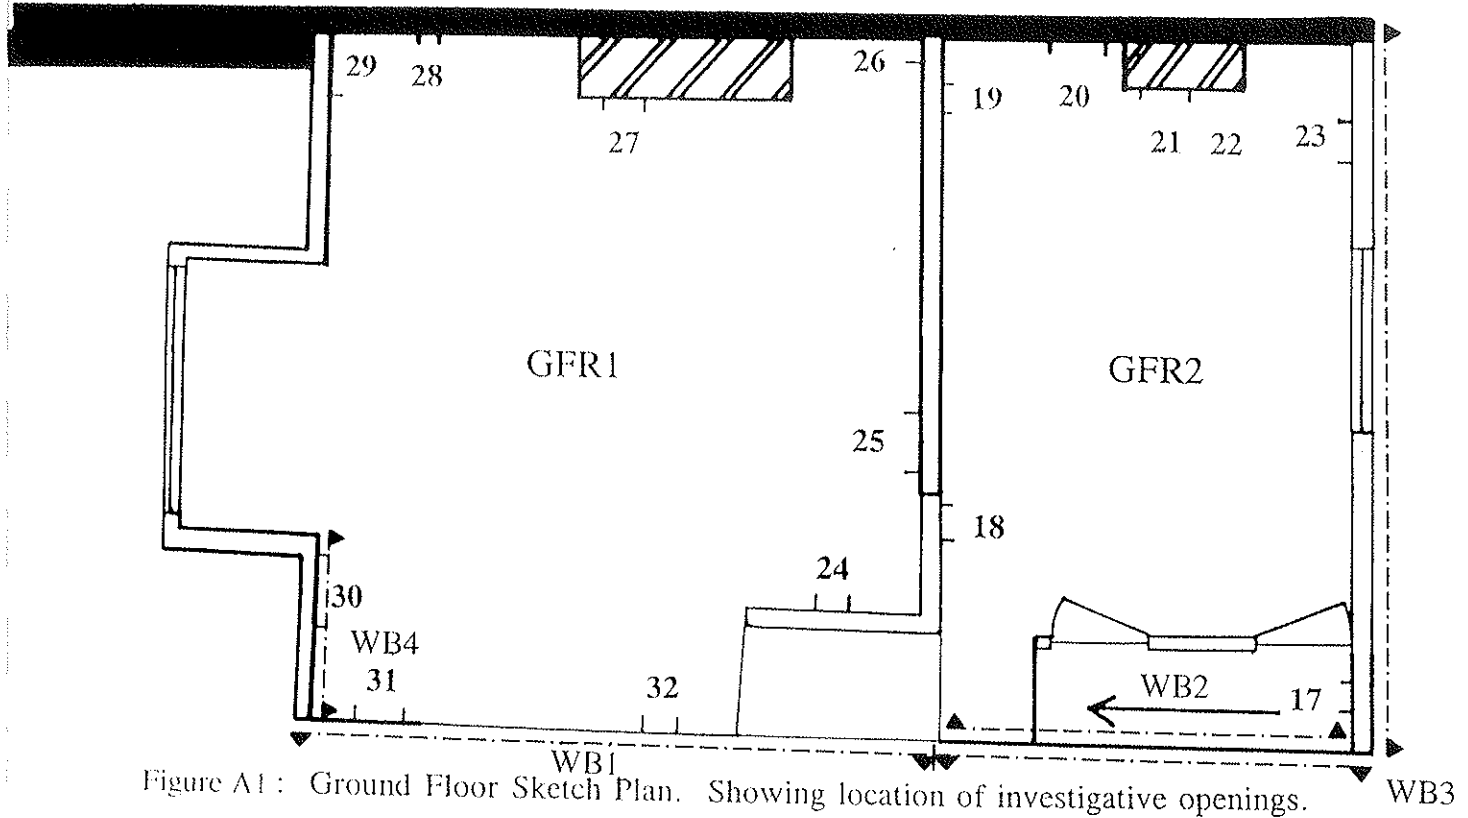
Ground Floor Sketch Plan. Showing location of investigative openings.
